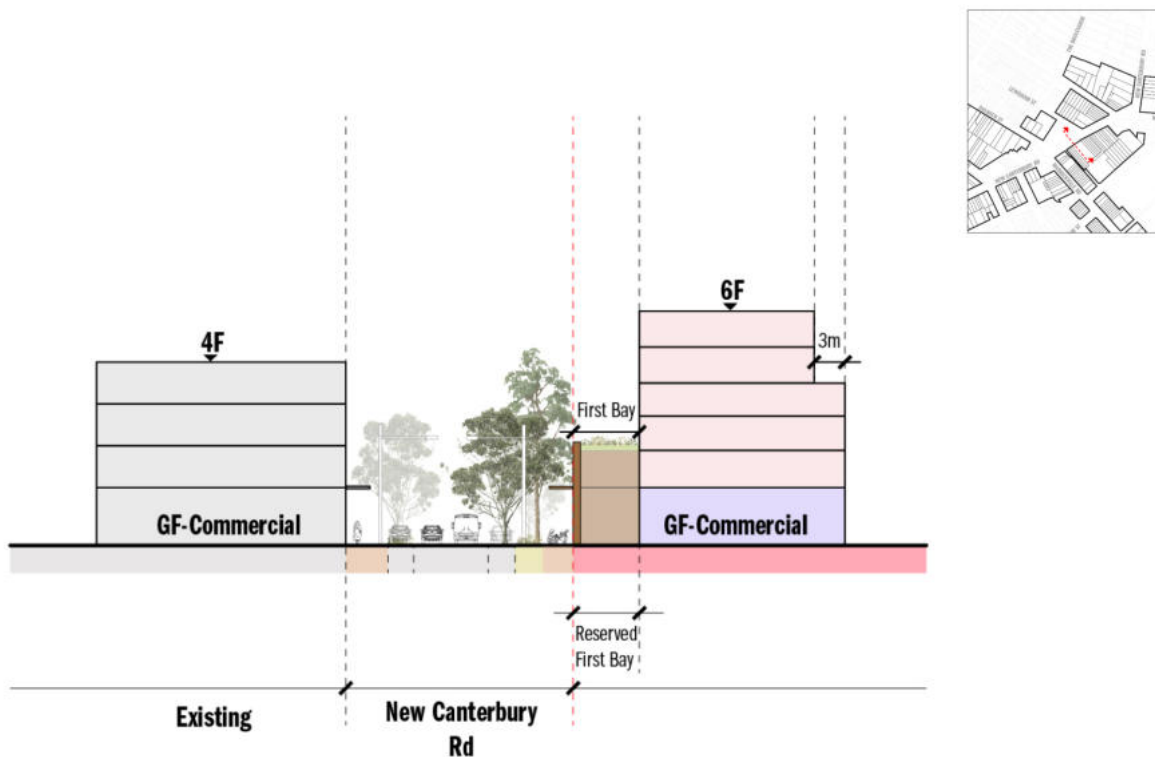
Dulwich Hill Village - New Canterbury Road Section
